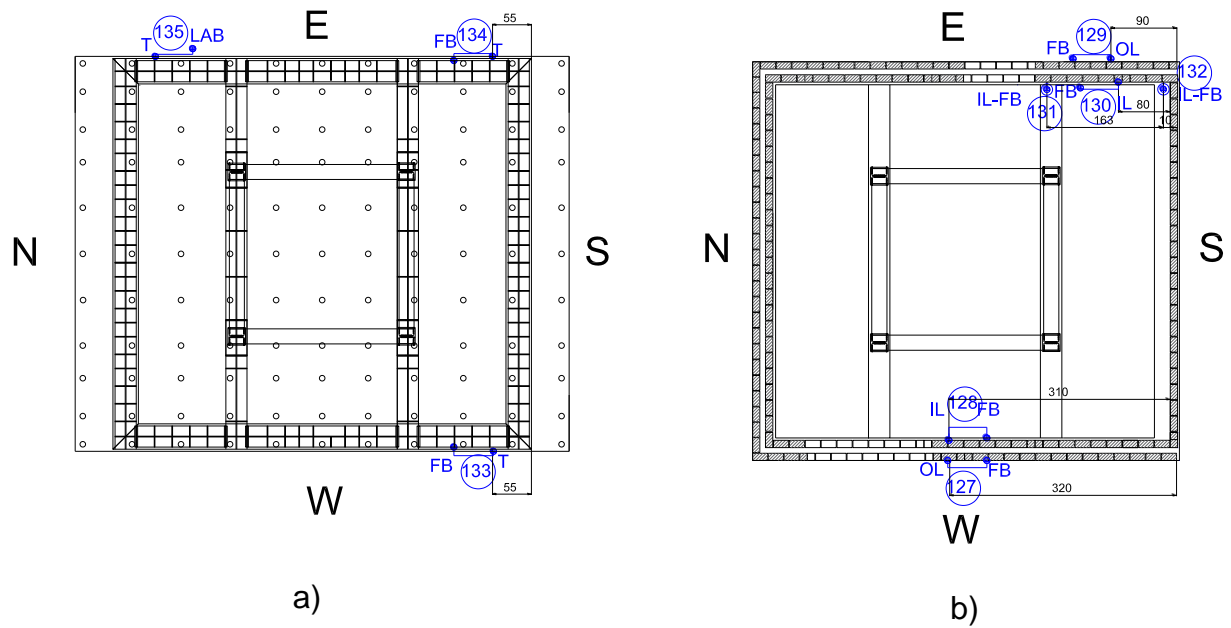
Linear potentiometer plan views: a) foundation level; b) ground-floor level.
